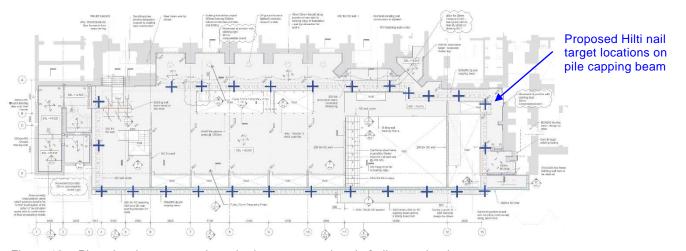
Plan showing proposed monitoring targets at head of pile capping beam
